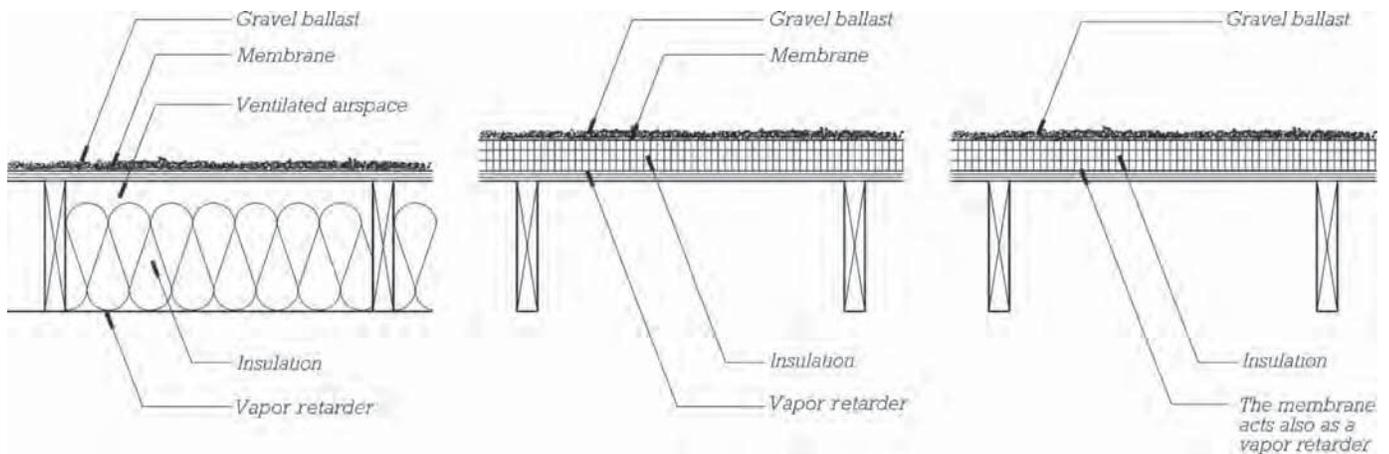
Low-slope roofs with thermal insulation in three different positions, shown here with a wood joisted roof deck. At left, insulation below the deck, with a vapor retarder on the warm side of the insulation. In the center, insulation between the deck and the membrane, with a vapor retarder on the warm side of the insulation. At right, a protected membrane roof, in which the insulation is above the membrane.
